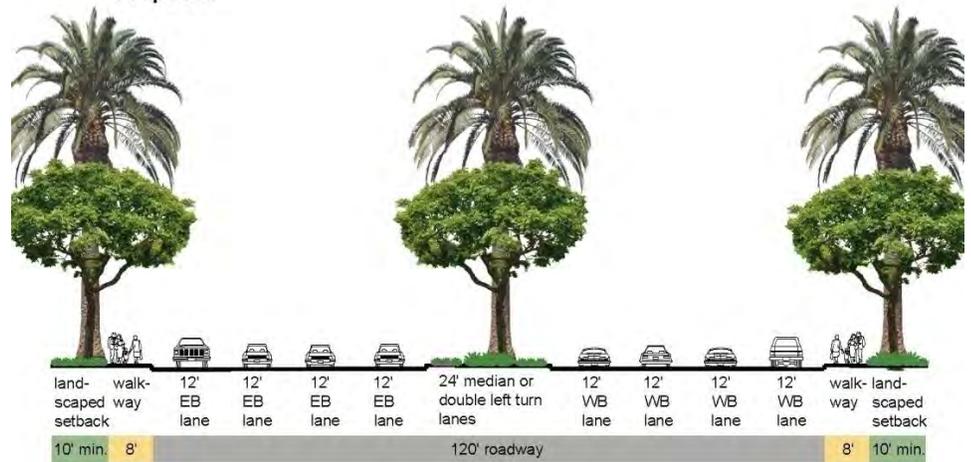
B Crown Valley Parkway: Cross Sections—Looking West
